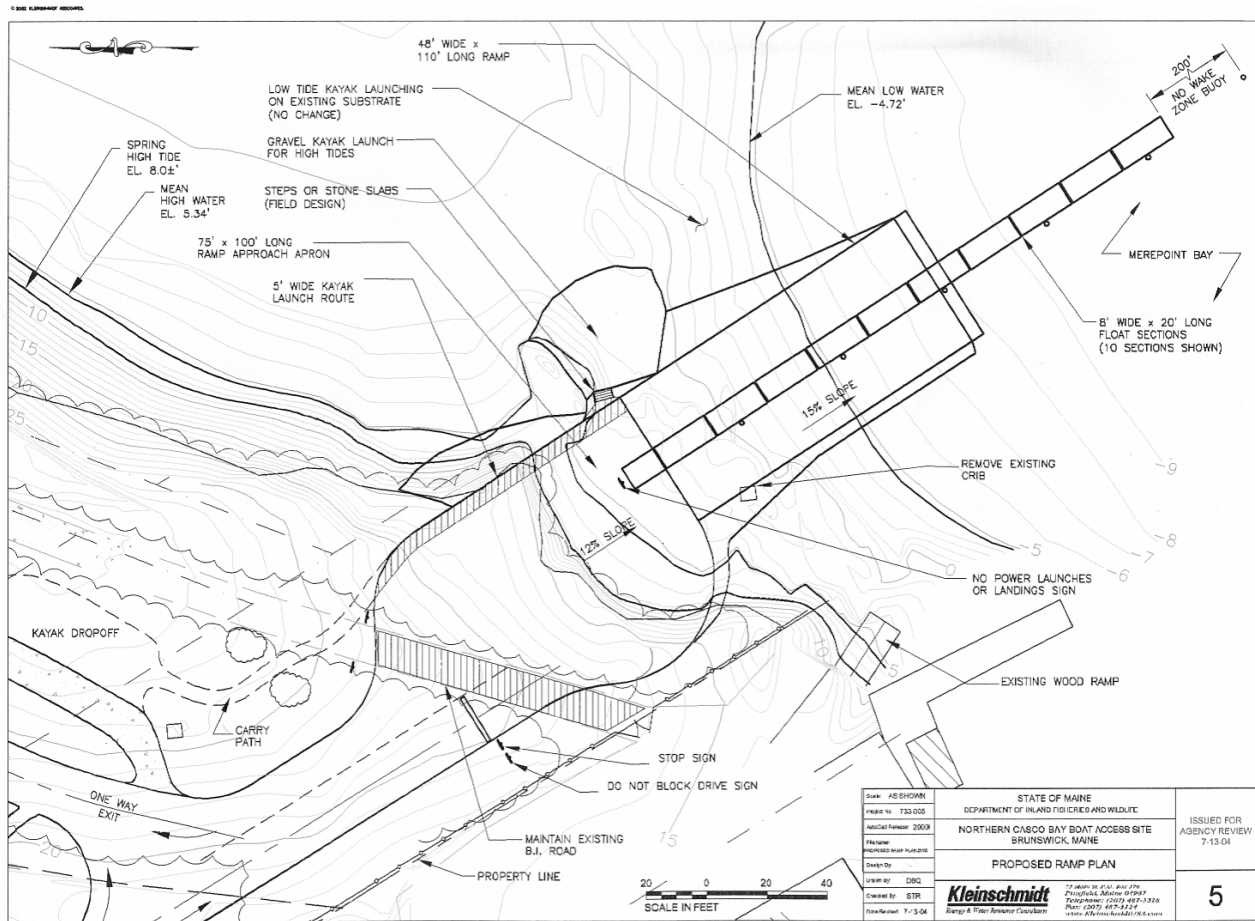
Launching ramp details - (Source: Kleinschmidt, 07-13-03)
